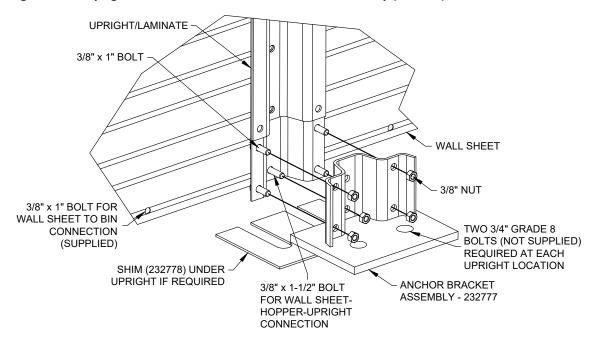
Upright, Wall Sheet and Anchor Bracket Assembly (232777)
